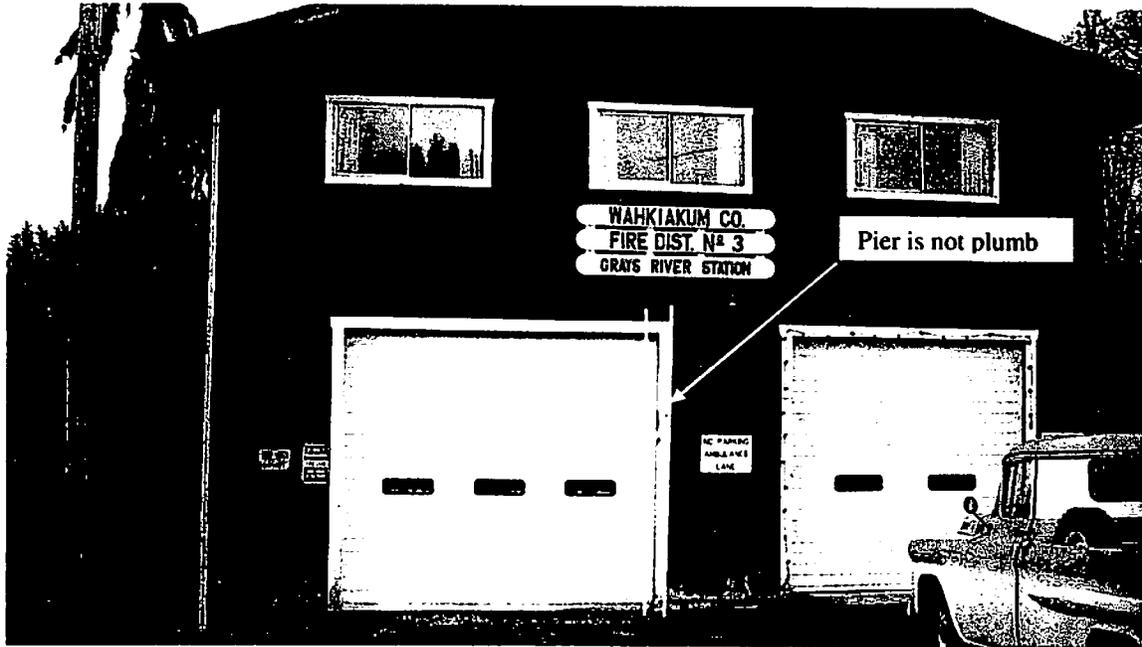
Shear deformation damaged sheathing and door trim.
